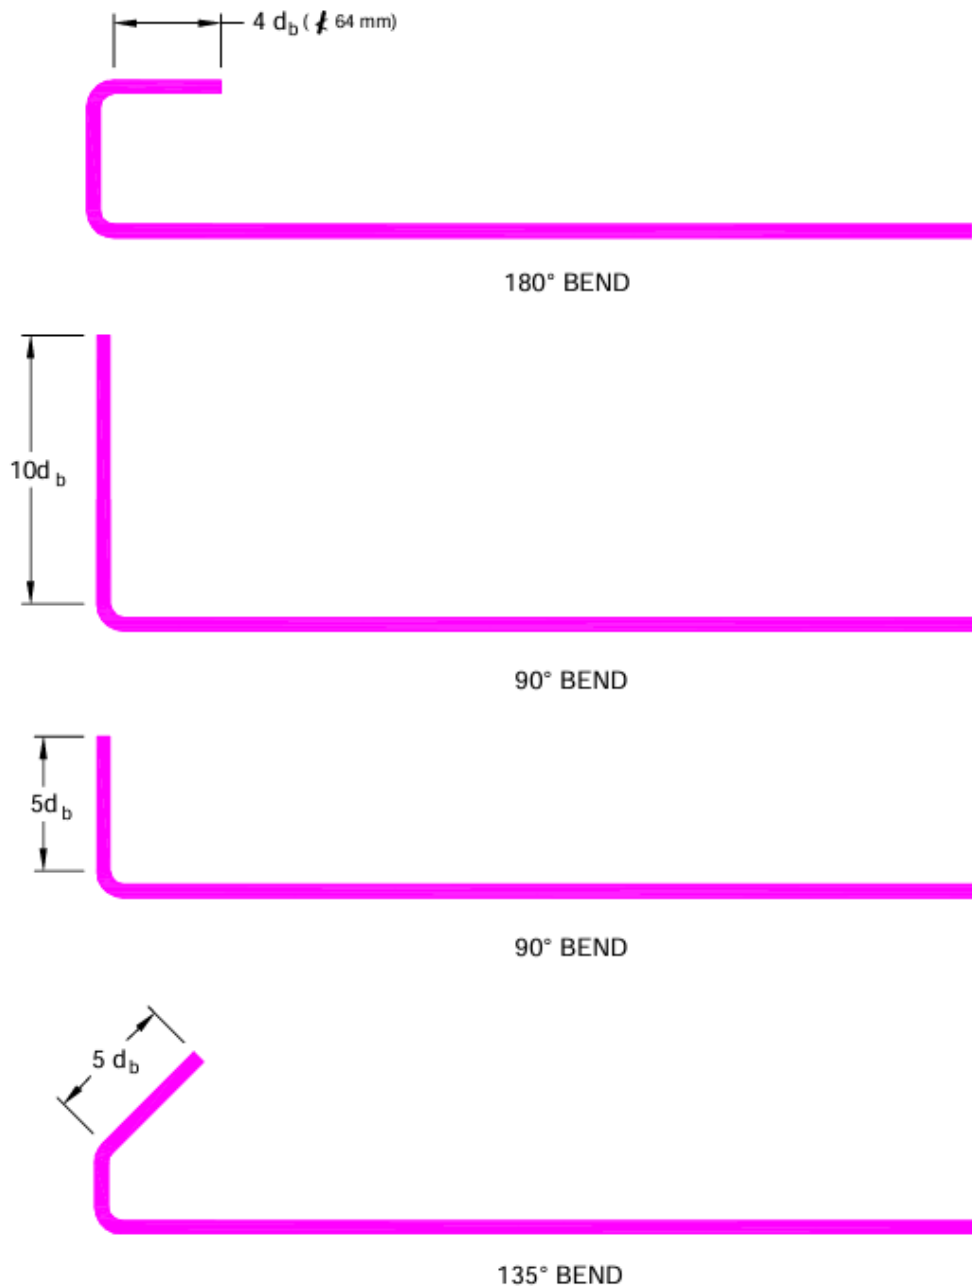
STANDARD HOOK OF A REINFORCING BAR
